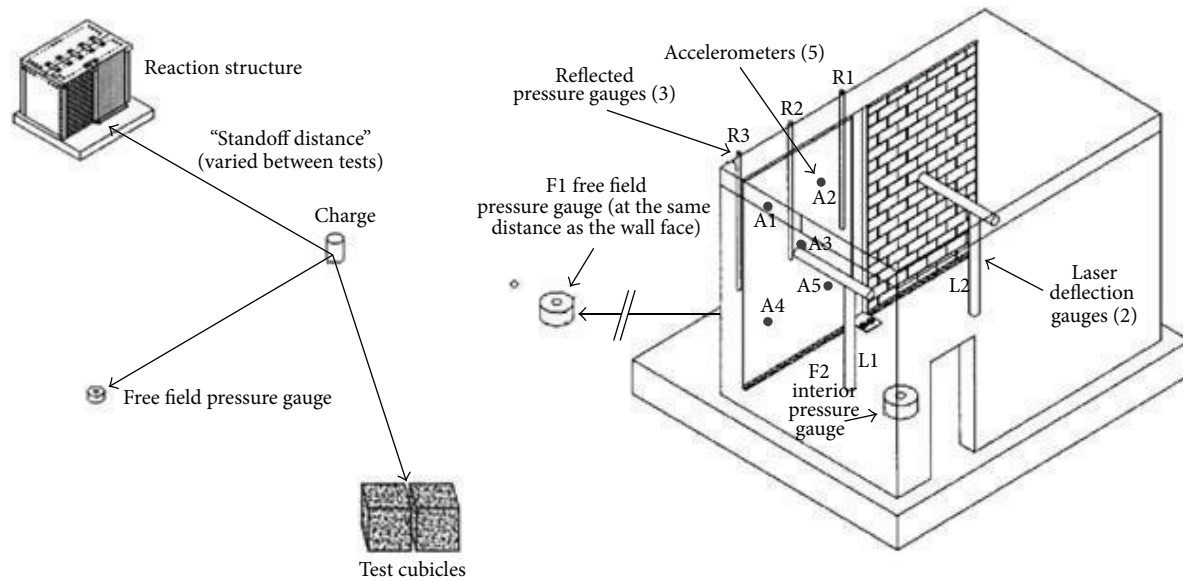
Full-scale masonry wall test setup [8, 9].
